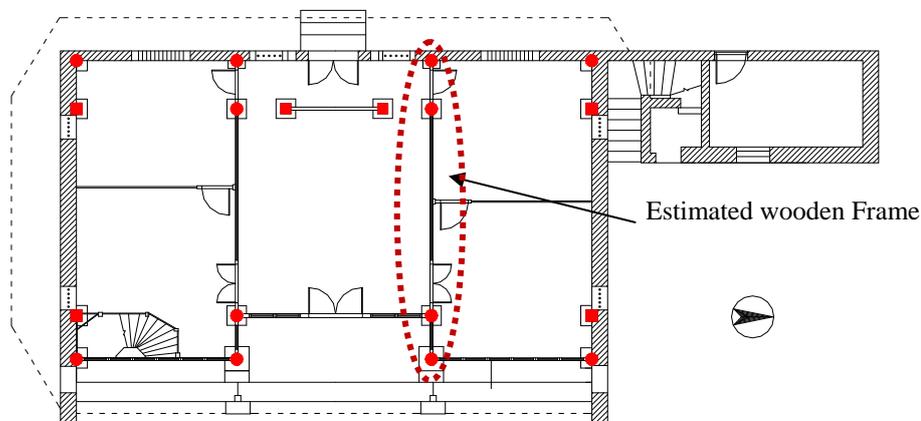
The first floor plan of Yanshuei Octagonal Display Hall (Chang, 2004)
